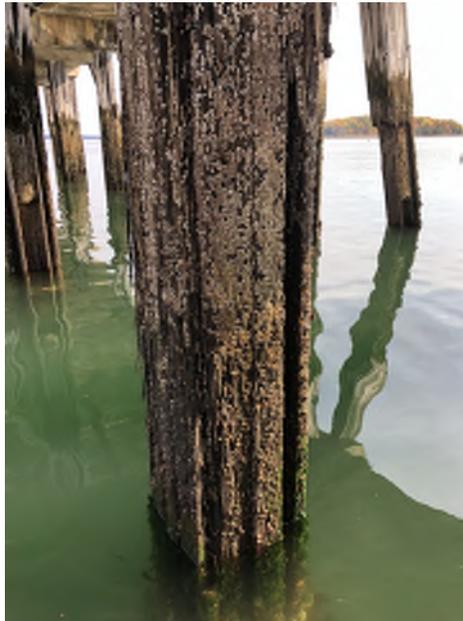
Typical condition of timber jacketing. Taken by ASC on 10/22/2020 at 11:00AM.
